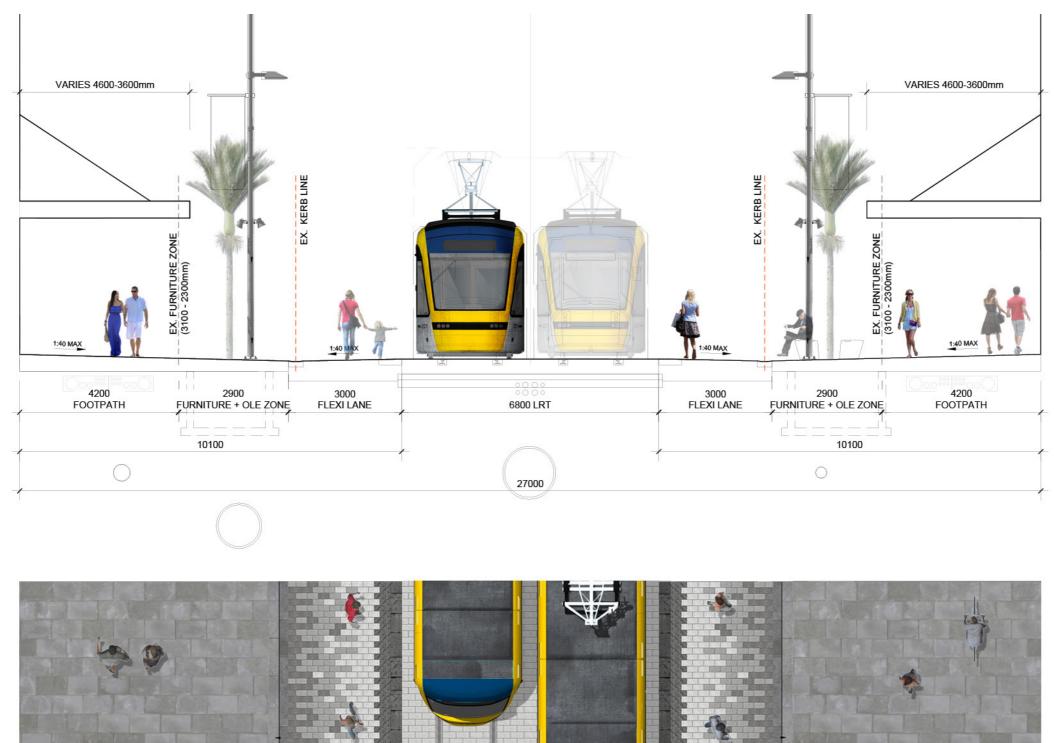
Partial plan and section of Queen Street between Wellesley Street and Customs Street looking north. Centrally located carriageway with through vehicular traffic removed. servicing provided at offpeak hours via 3000-3500mm
